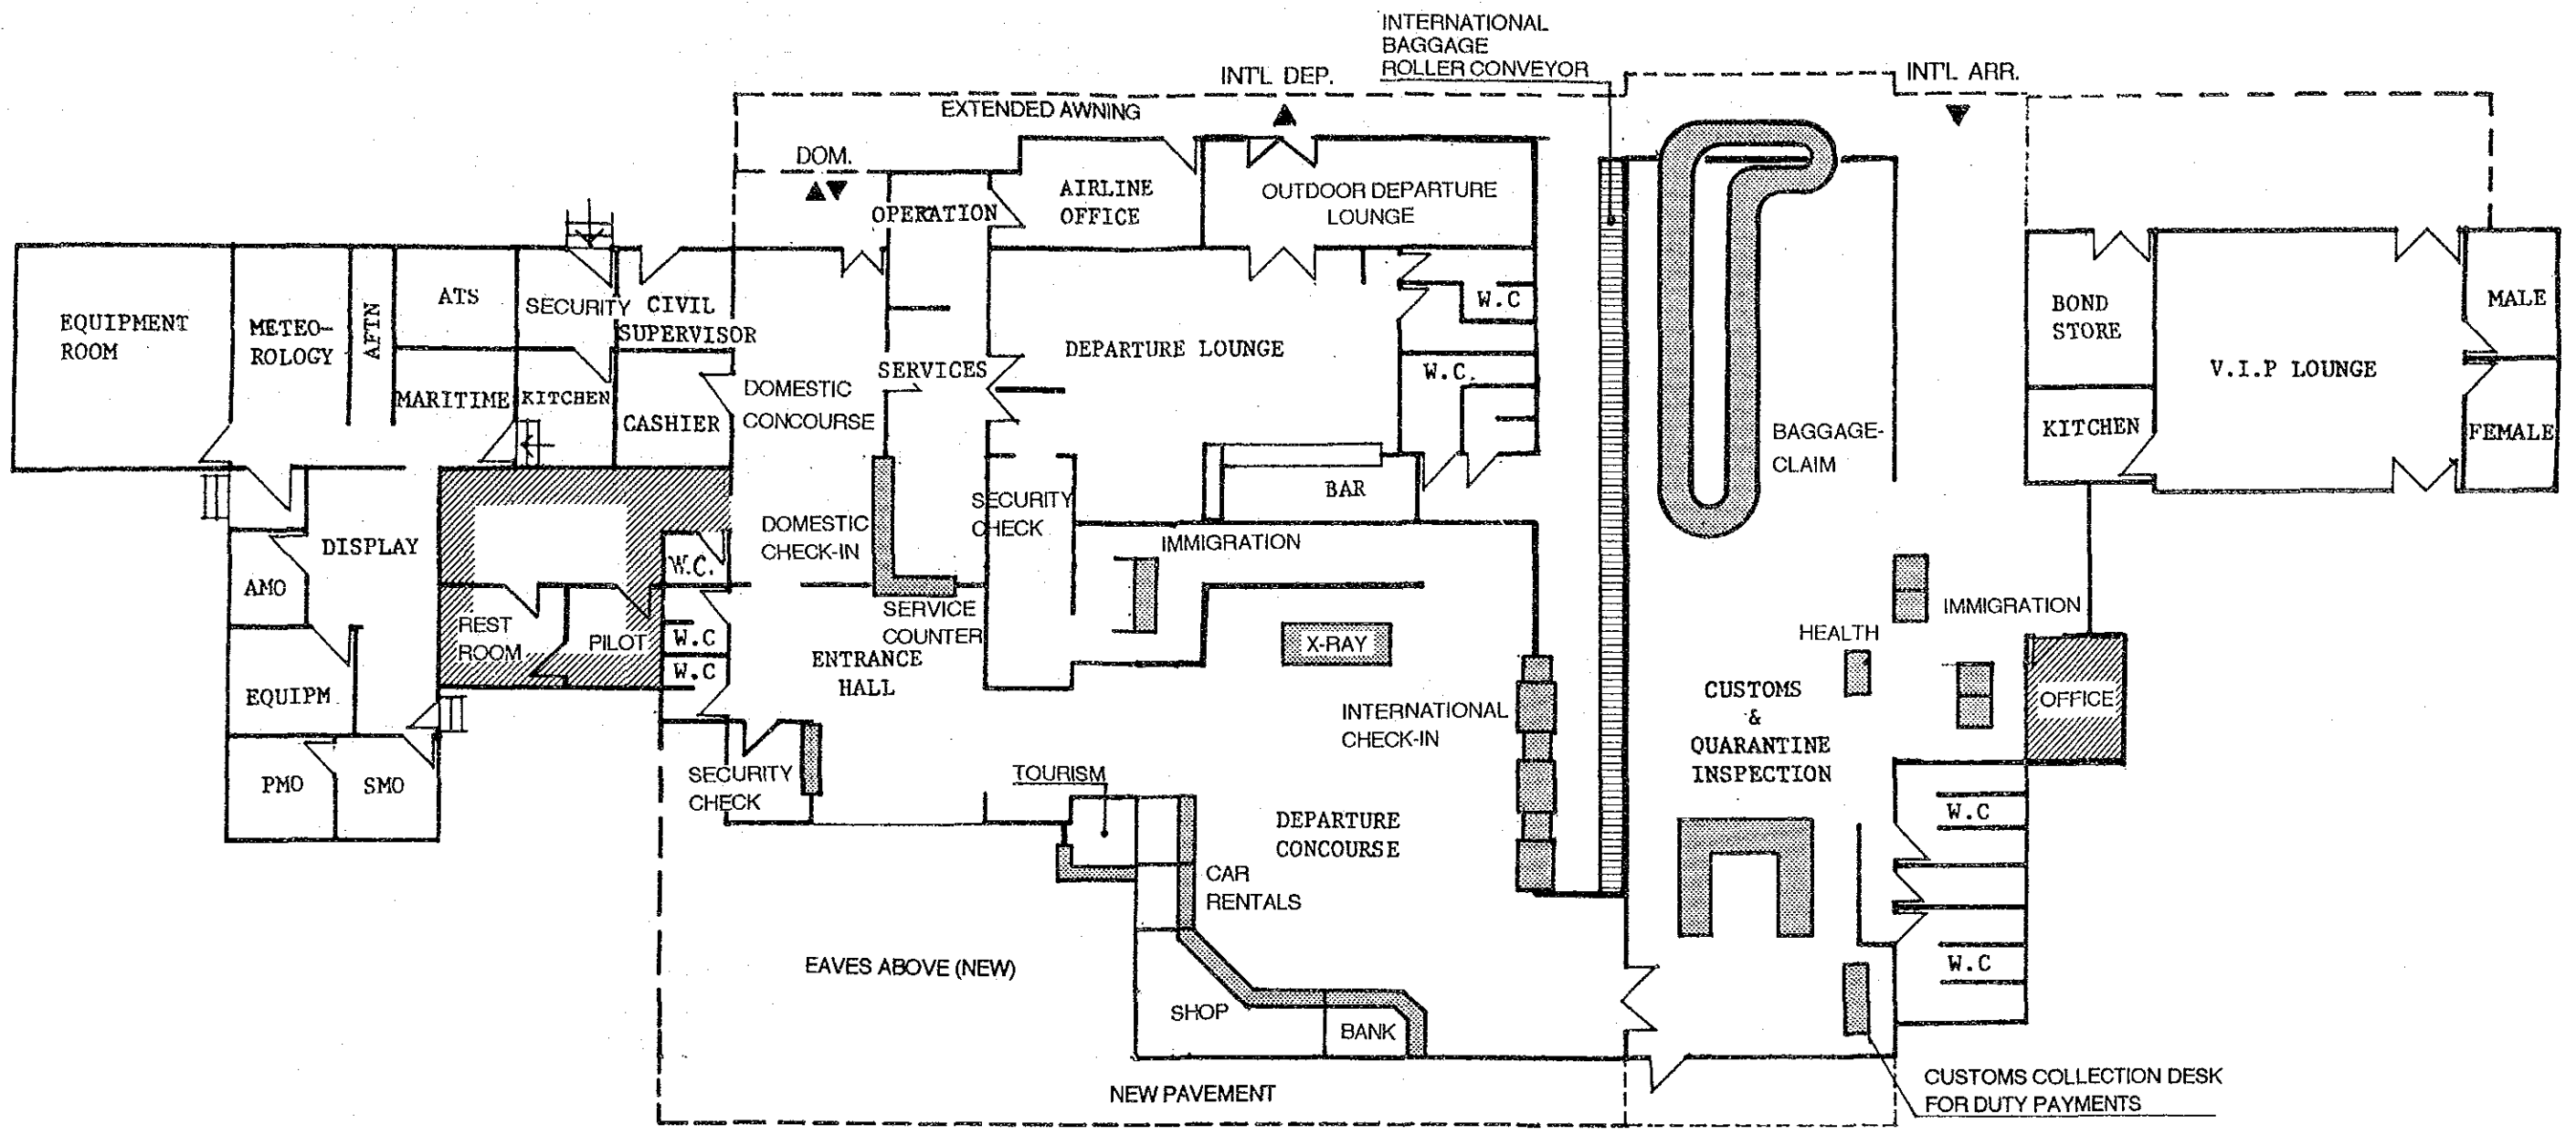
Layout Plan of Tentative Improvement work
